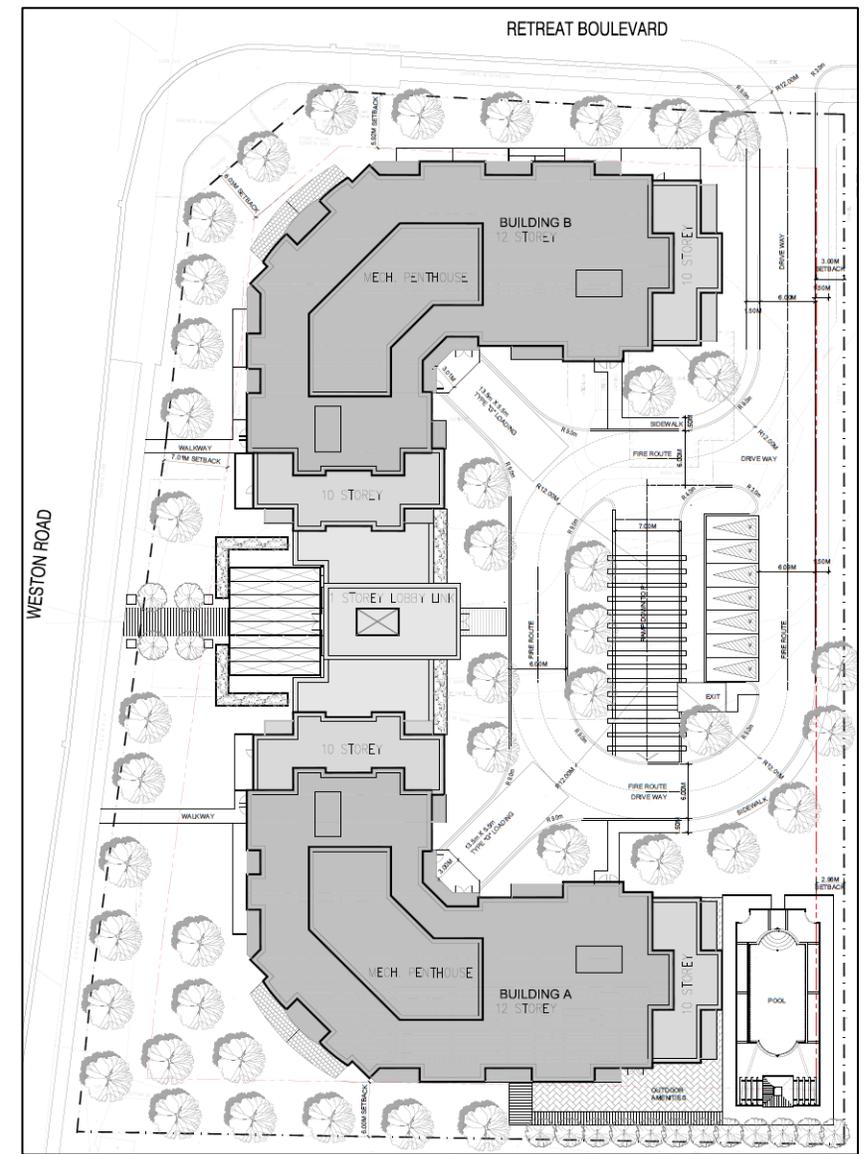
Original Site Plan (1st Submission, Dec., 19, 2011)
